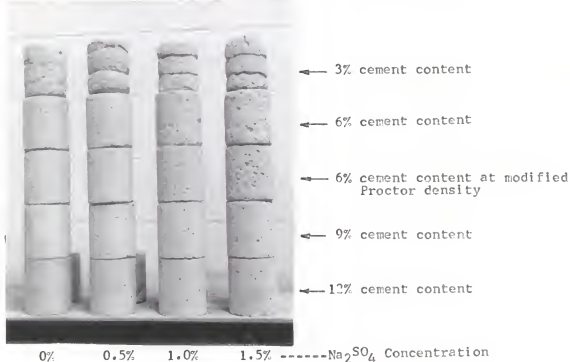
Specimens after 12 Cycles Wet-dry Test.
